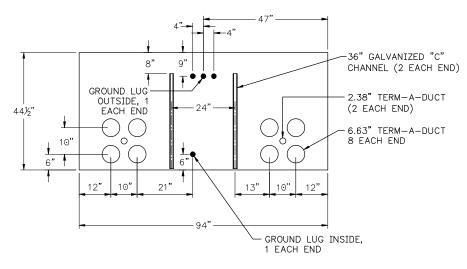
Sleeve TERM-A-DUCT and "C"-Channel Requirement Detail
